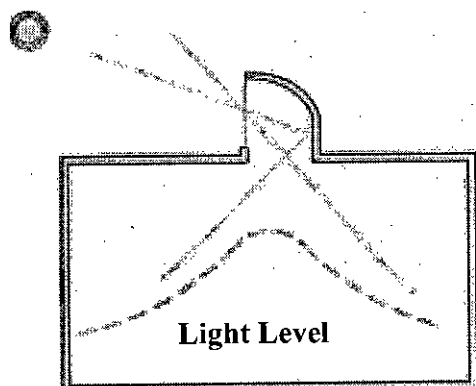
A single-sided roof monitor system designed to allow winter sunlight to enter but not summer sunlight. (Source: Boubekri, 2008)
